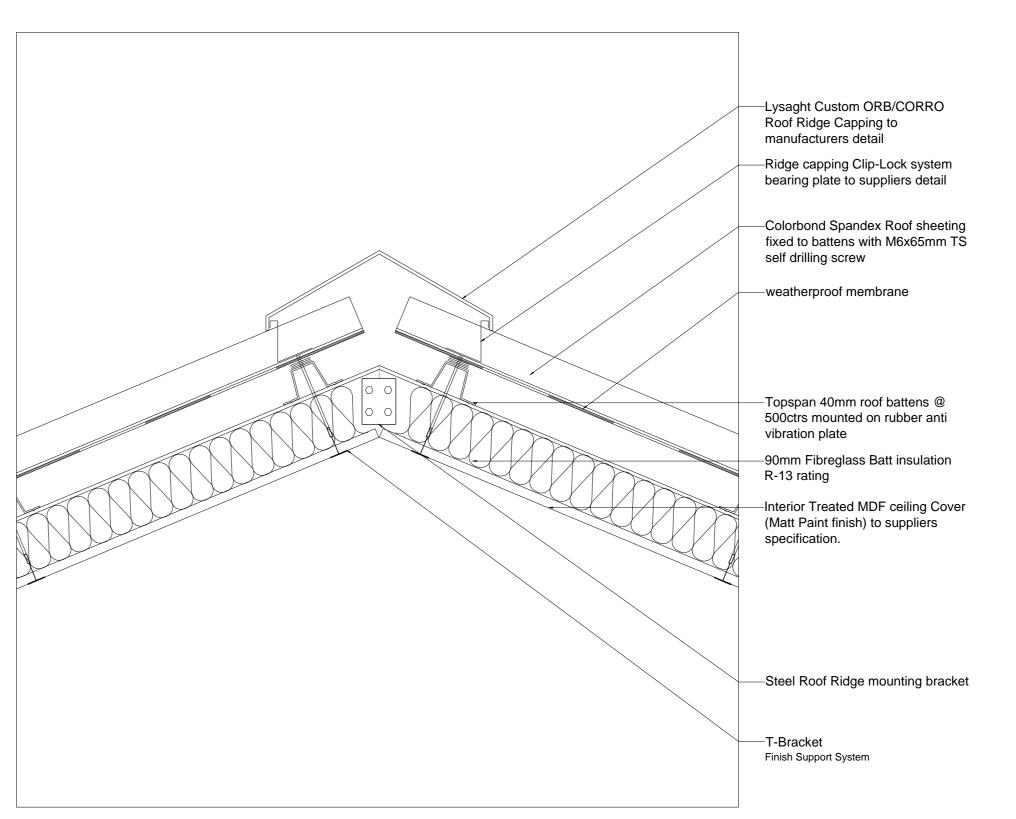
DETAILS TO INDICATE CONSTRUCTION SYSTEM
